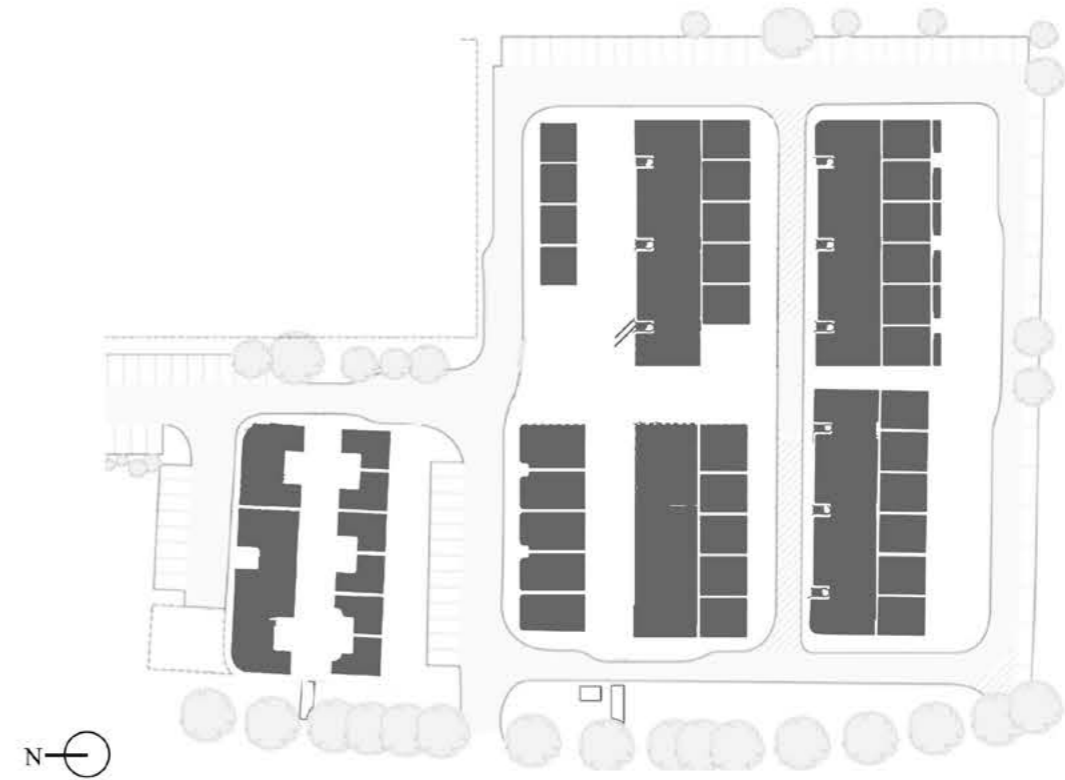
Figure ground plan of BedZed Eco Village development
